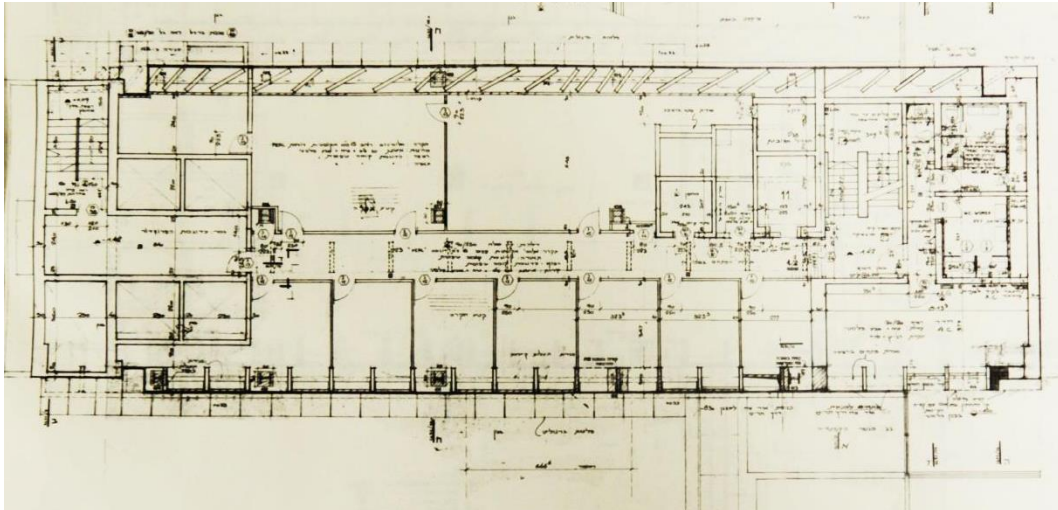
Architectural plan of level -1.42 of the Eshkol Tower, as appears among the March 1974 tender plans (University of Haifa Archive). The plan shows the original sun breakers design of Niemeyer as was already realized in the tower's basement floors
